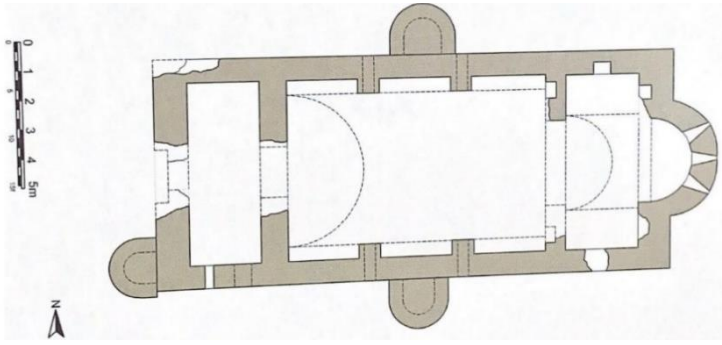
Muşar Mountain Church Plan Diagram (Source: EACHAR, 2018)
